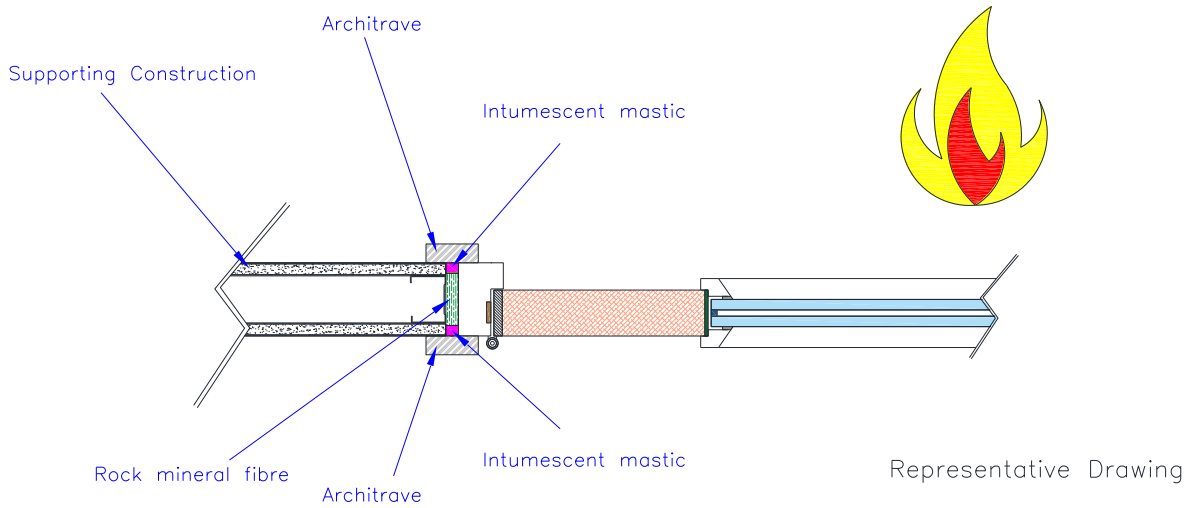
Details of Supporting Construction to Frame, Fire Stopping – Doorset B
